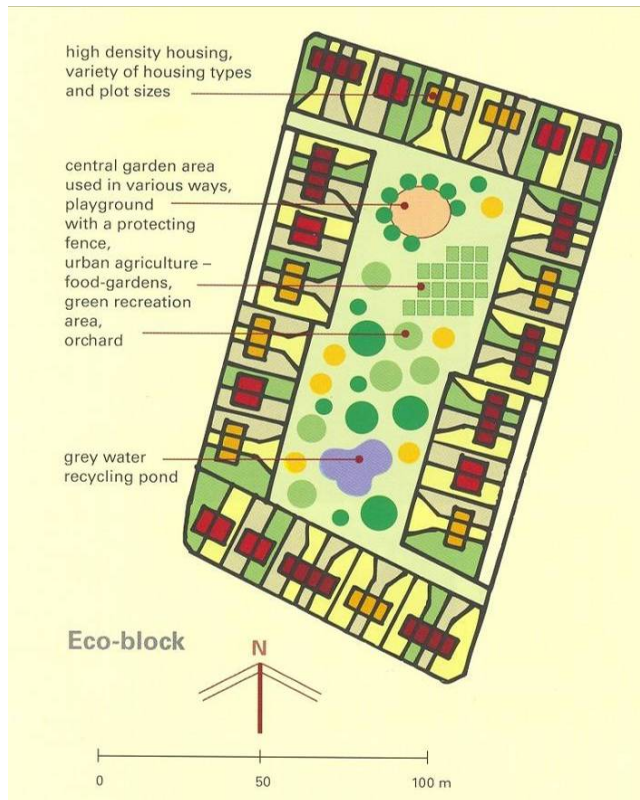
Plan of eco-blocks (Source: SIDA booklet, 2002:10)
